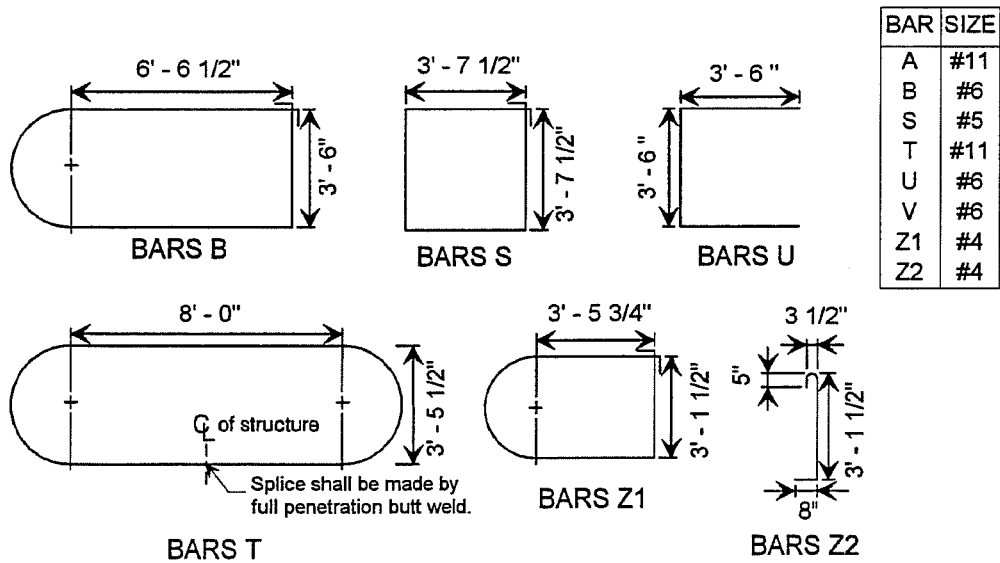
Typical Pier Steel Reinforcing Pattern
